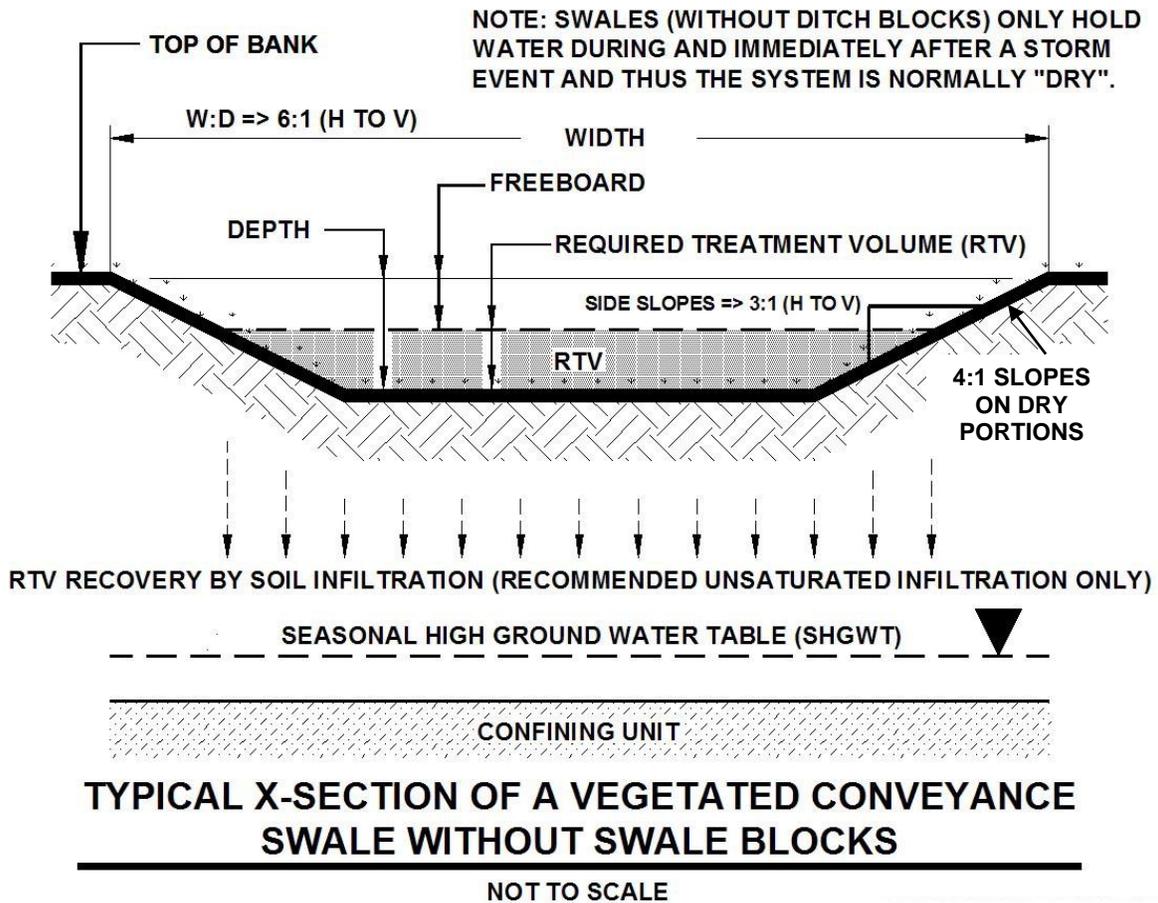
Typical Cross-section of a Conveyance Swale without Swale Blocks
